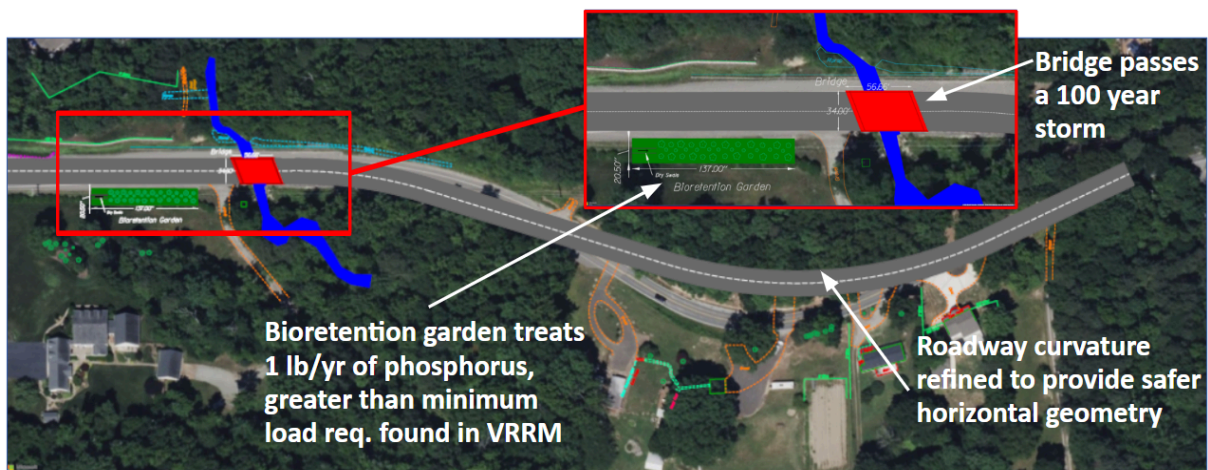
Plan View of Proposed Roadway, Bridge Structure, and Bioretention Garden
